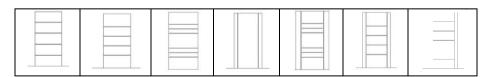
Typical Decoration Wall Molding (Facade Schematic)
